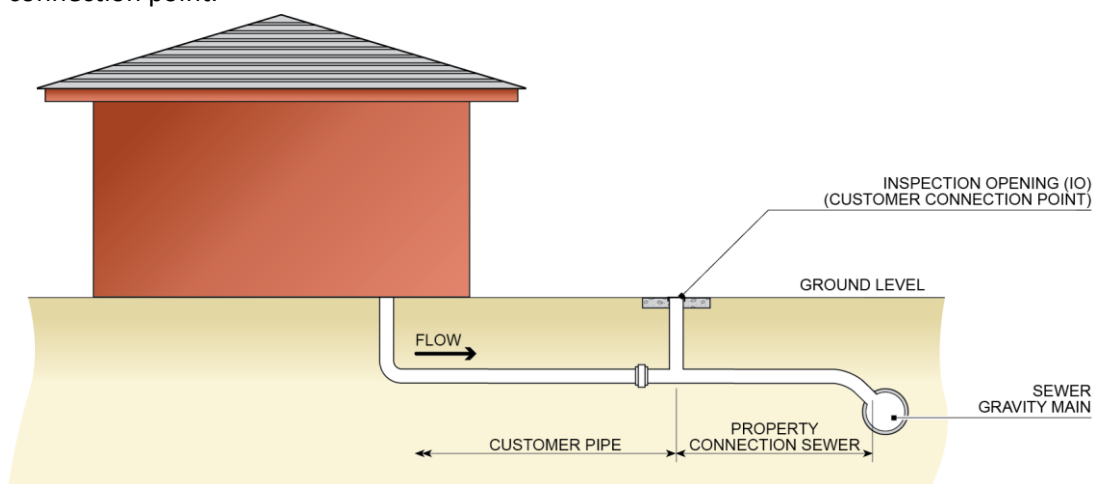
A diagram of a typical sewer (gravity) customer connection point (note that a similar arrangement occurs when a boundary trap is used instead of the IO)
